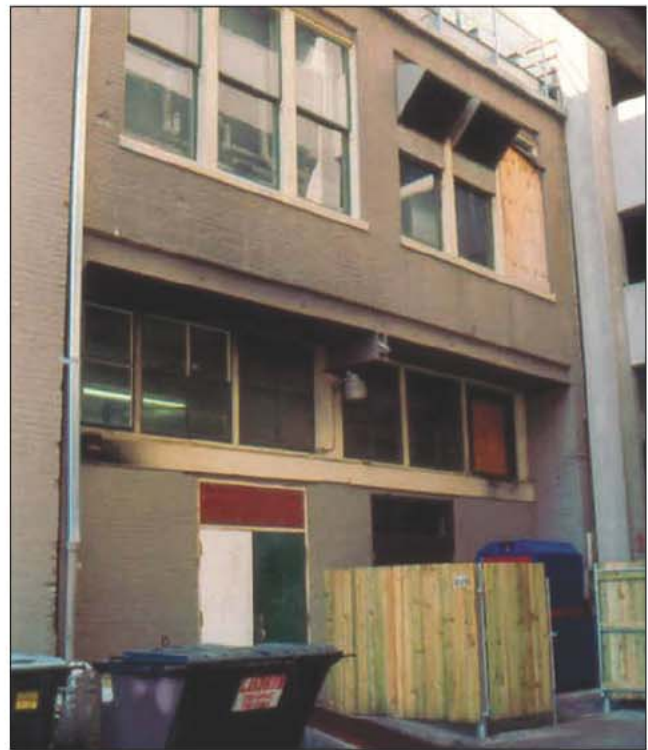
A building in which the first floor exterior masonry wall has been removed and set back into the building from its original location. This renovation has changed structural support of the second floor and roof and the second-floor brick exterior wall. These components of the building had been supported by a masonry wall and are now supported by steel columns and beams. This renovation has changed the structural hierarchy of the building and has changed the collapse potential of the wall. The steel beam will be heated and may fail much sooner than the original masonry wall.
